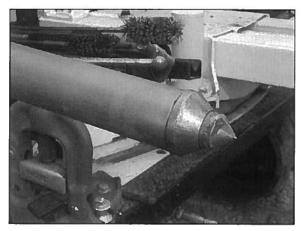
Thread the cutting shoe and point onto the sample tube.
